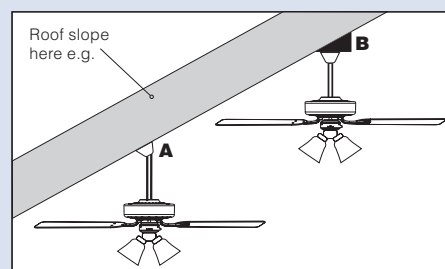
Mounting ceiling fans on sloping roofs or ceilings
